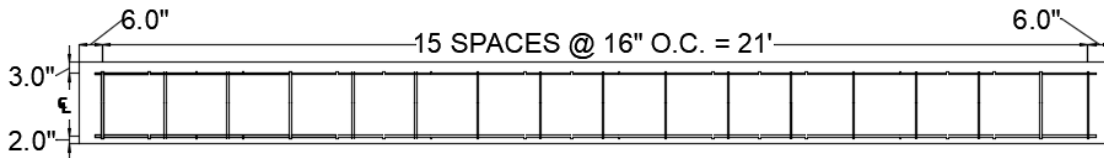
Voided Deck Slab Transverse Rebar Configuration
